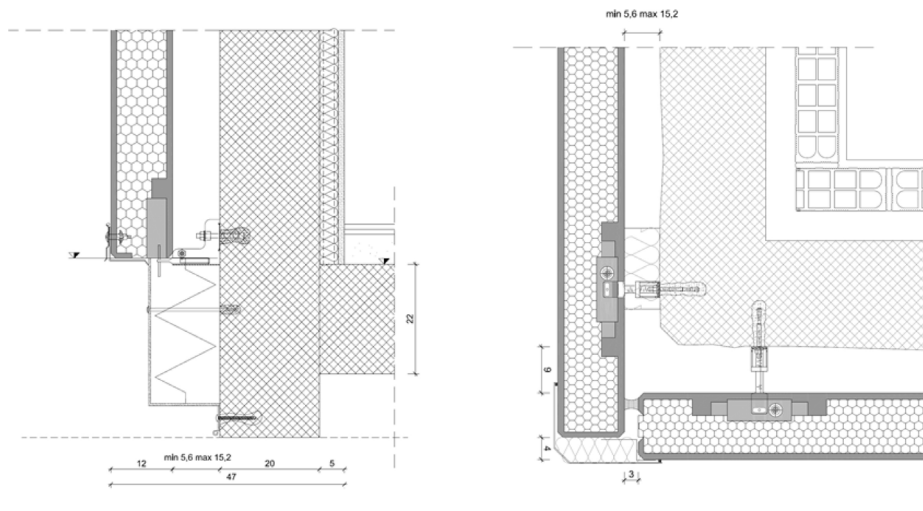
Technical detailed drawings of the adopted solutions. Left: lower part of the wall. Right: wall-windows section. The thermal bridge will be solve during the windows renovation.
